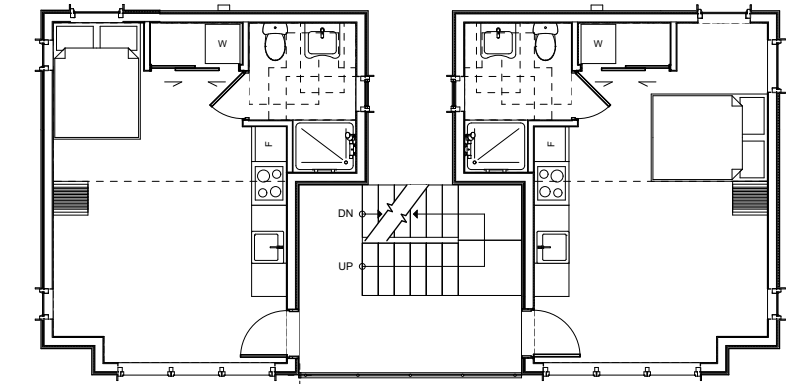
(above) Typical upper level floor plan (Jansen Court Apartments, SDR Packet 2017).
